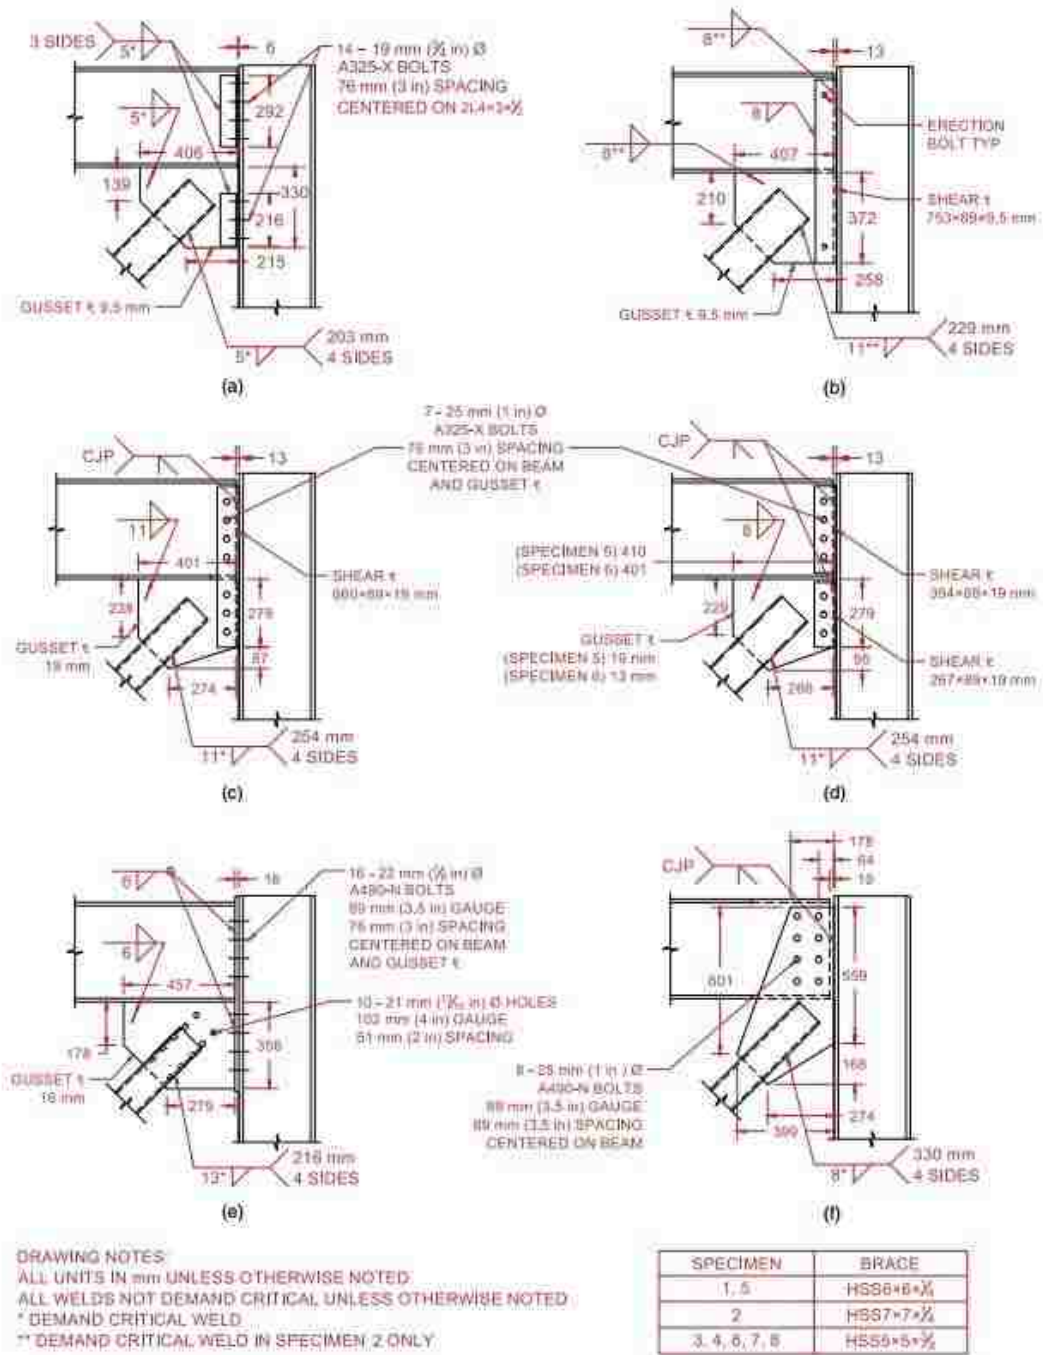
Connection detail of test specimens: (a) Specimen 1; (b) Specimen 2 and 3; (c) Specimen 4; (d) Specimen 5 and 6; (e) Specimen 7; (f) Specimen 8 (Sen et al. 2016b)
